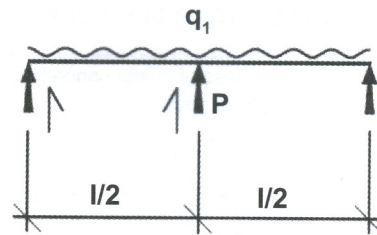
Precast Concrete Construction Methods And Beam Behaviours
